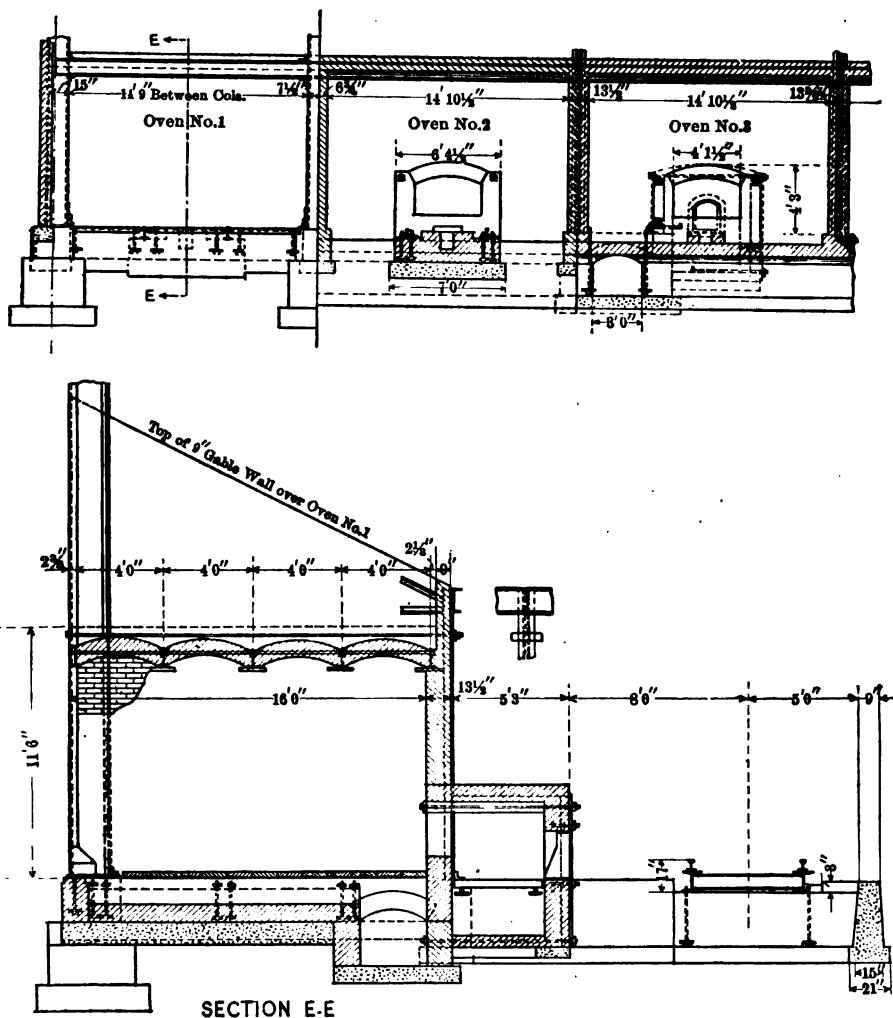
ELEVATION AND SECTION OF BOTTOM OVENS, BETHLEHEM STEEL CO.
